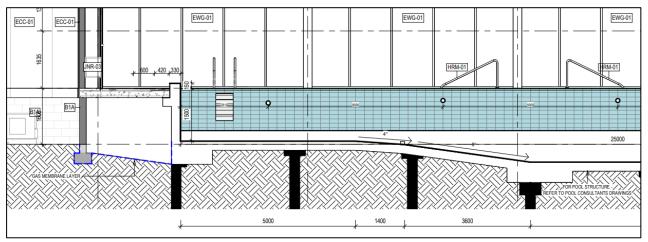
Extract from the pool facility – long north section showing 'Gas Membrane Layer' in blue (Source: Overall Pool Hall Long Sections, prepared by Populous, 15 December 2023)
